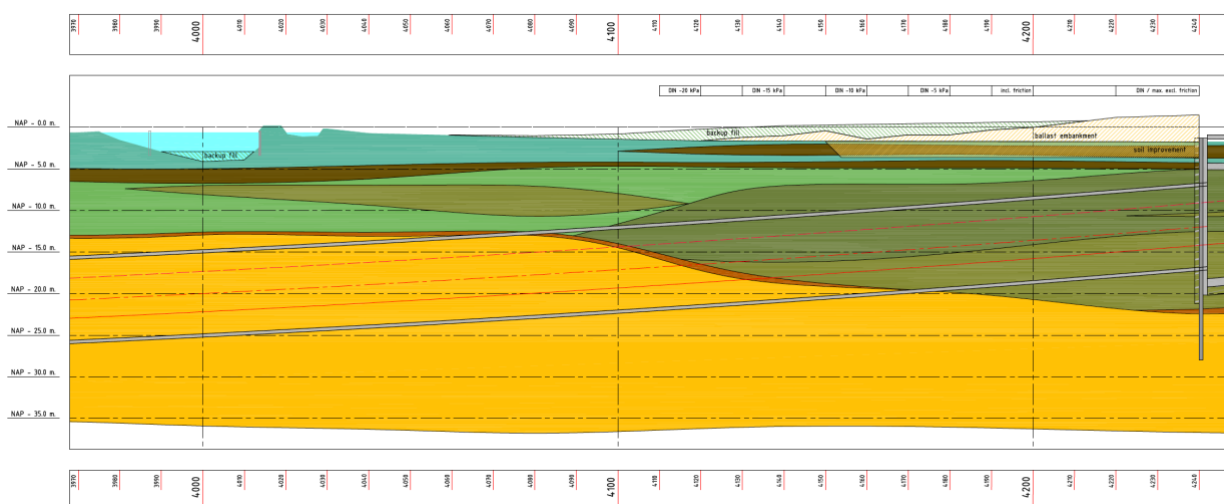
Schematic geotechnical profile cross-section at the location of the tunnel [5]
